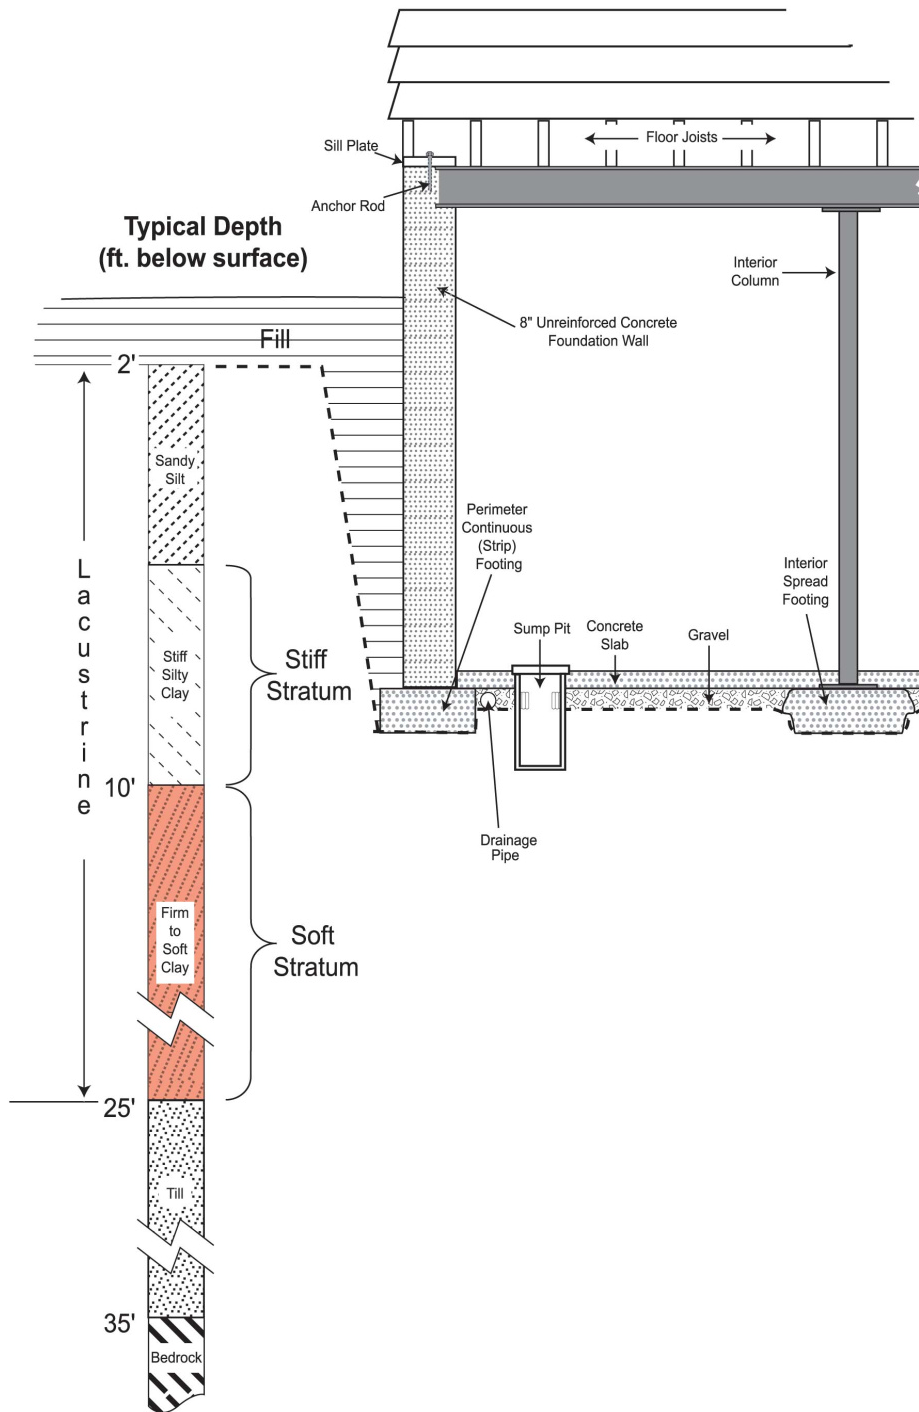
Schematic stratigraphic soil profile in central and northern Amherst showing typical construction of older houses. Many footings rest on a stiff stratum that overlies a soft stratum. Fill consists of remolded native material.
